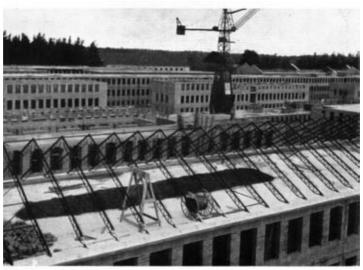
The H.Q. building, showing "Filigran" roof trusses.
